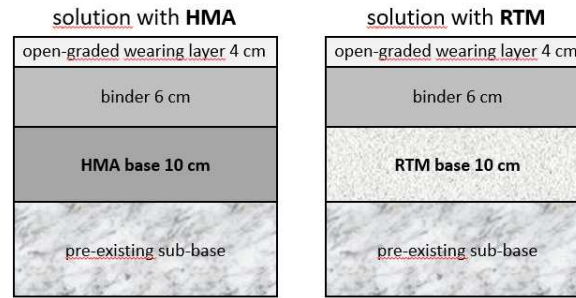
Pavement structure scheme for trial section 3: solution with HMA and with RTM
